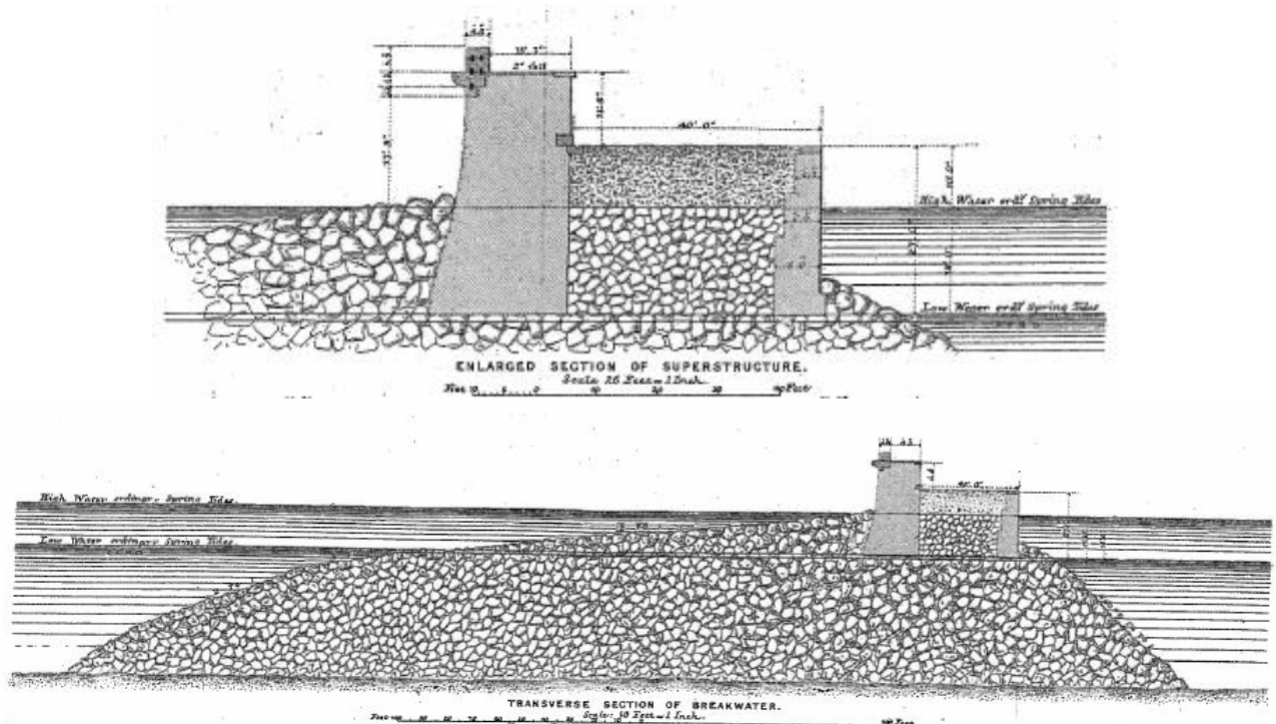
As built cross-section through Breakwater (Hayter, 1876)
